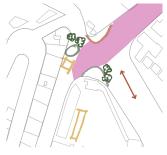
FLOORPLAN ENTRANCE MERCADO DE SAN ROQUE
